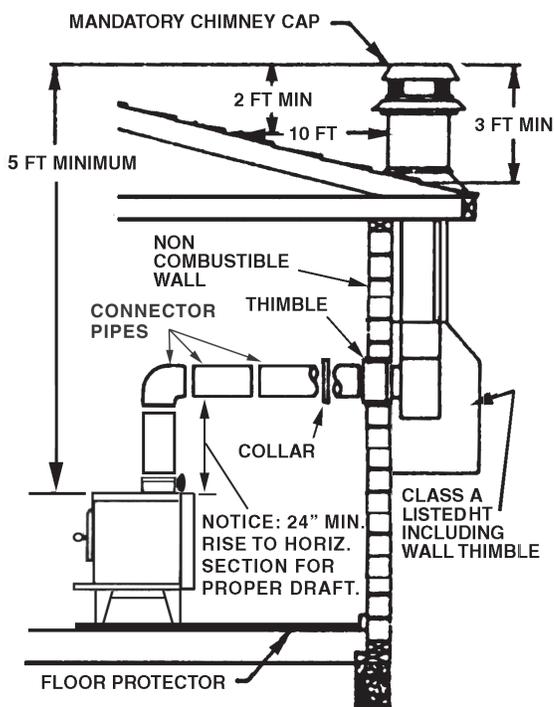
Chimney Connection to Firebox through Masonry Wall
